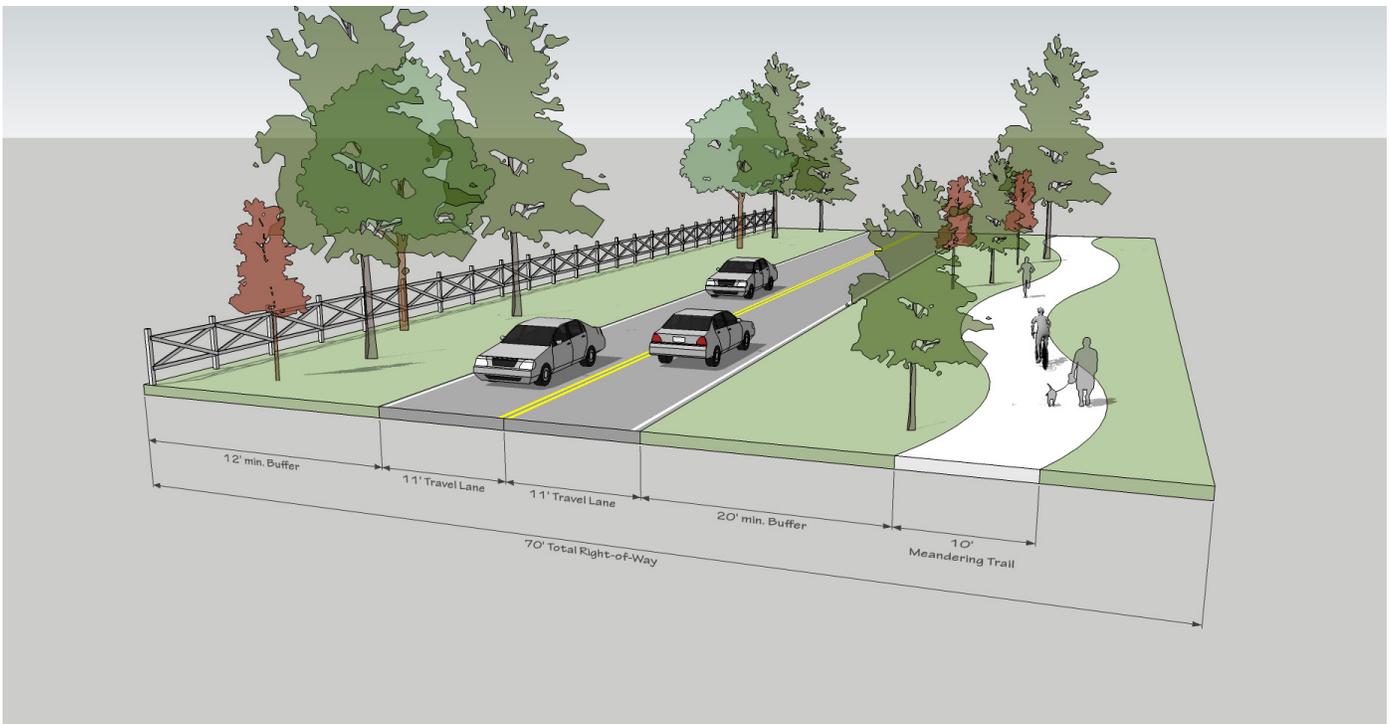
Pastoral Collector Typical Section (Road Buffer includes barrow ditches)
